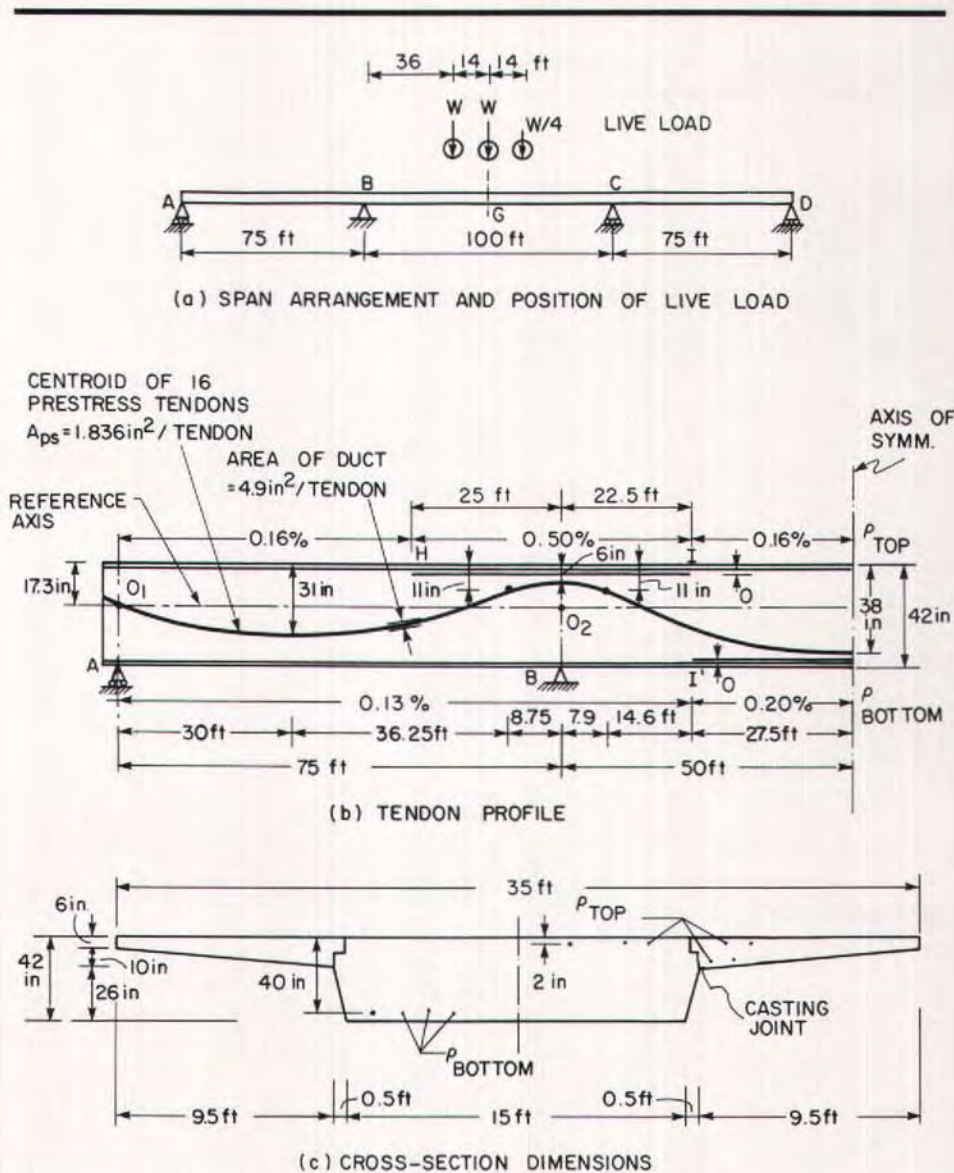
Three-span concrete bridge cast and prestressed in stages (Example 2).
